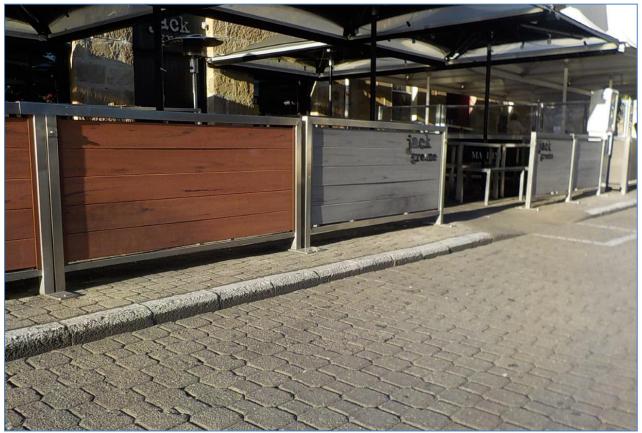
Raised Kerb – Salamanca Place (Kennedy Lane to Wooby's Lane)
